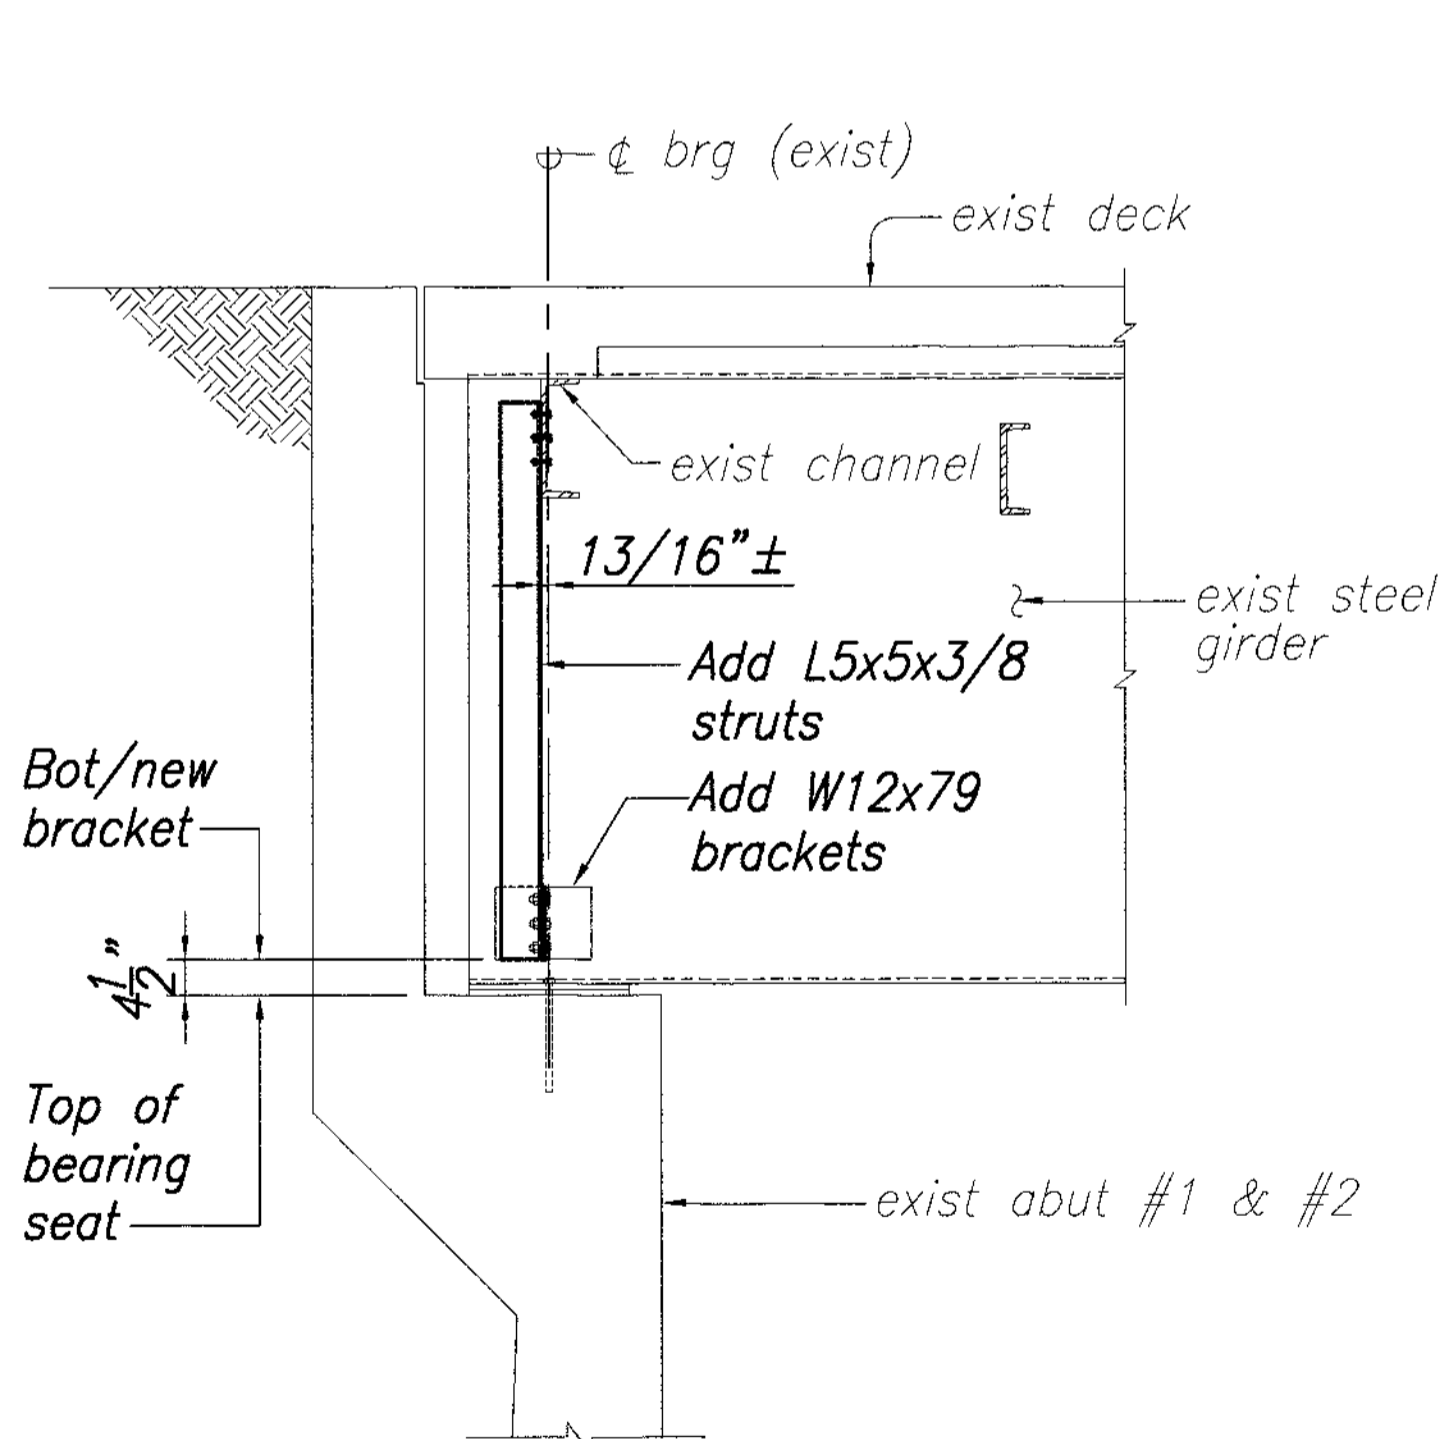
DETAIL OF ADDITIONAL STRUT TO EXIST. END DIAPHRAGM & CONCRETE BLOCK RESTRAINT
